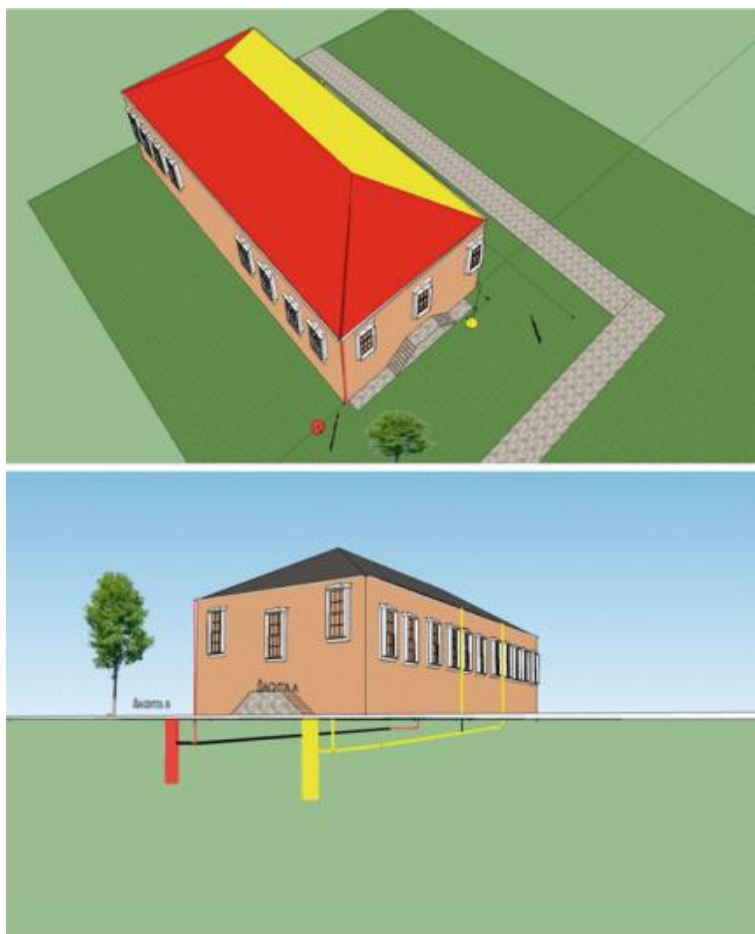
Drainage of rainwater from roof of building PK6 (Markovič and Vranayová 2013)
